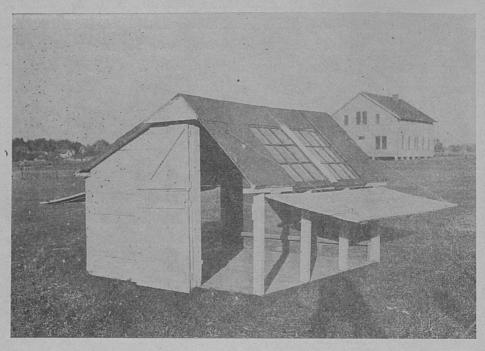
Kentucky Sunlight Hog House C 6-94-1. Front and rear doors raised to provide summer shade.
